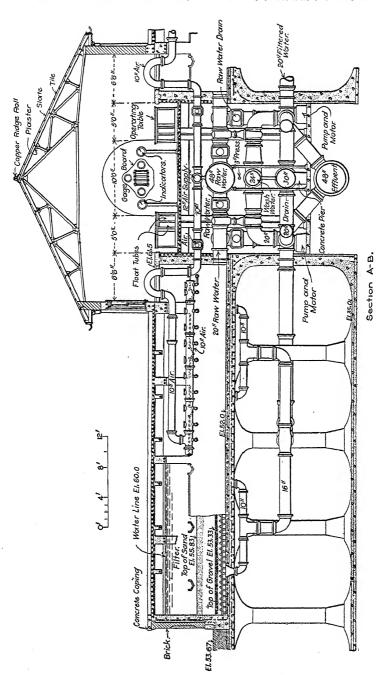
Cross-section of Columbus, Ohio, filters showing air piping and water piping.
